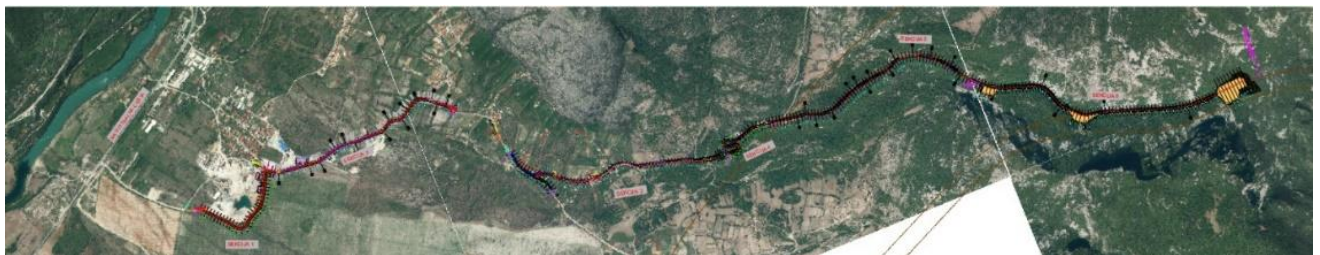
Overview of sections SR1, SR2, SR3, SR4, SR5 and SR6 of access road to Prenj Tunnel on the southern side
